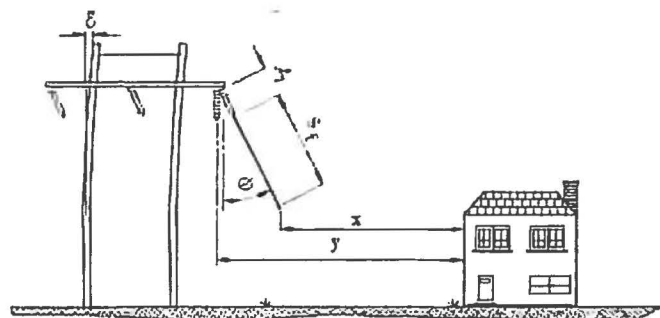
HORIZONTAL CLEARANCE REQUIREMENT TO BUILDINGS
